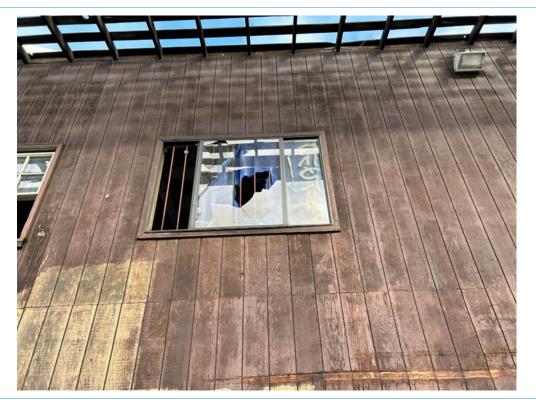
Overview of east elevation of structure and hopper, facing west.
